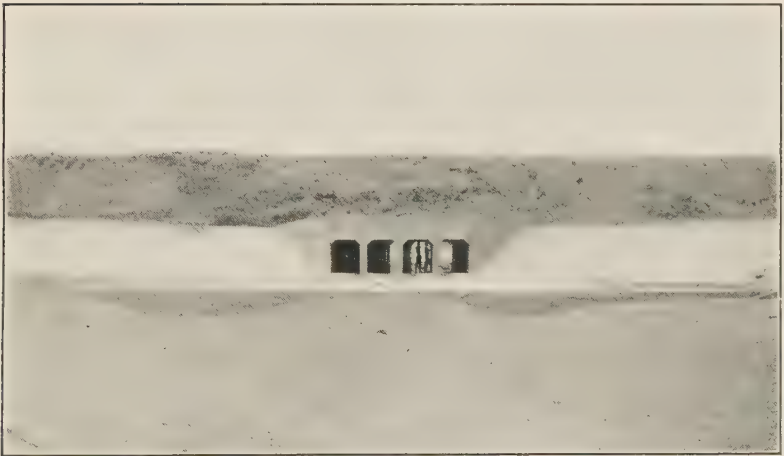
FIG. B.—Outlet of Dry Sheep Creek culvert on Interstate Canal. North Platte Project, Neb.
